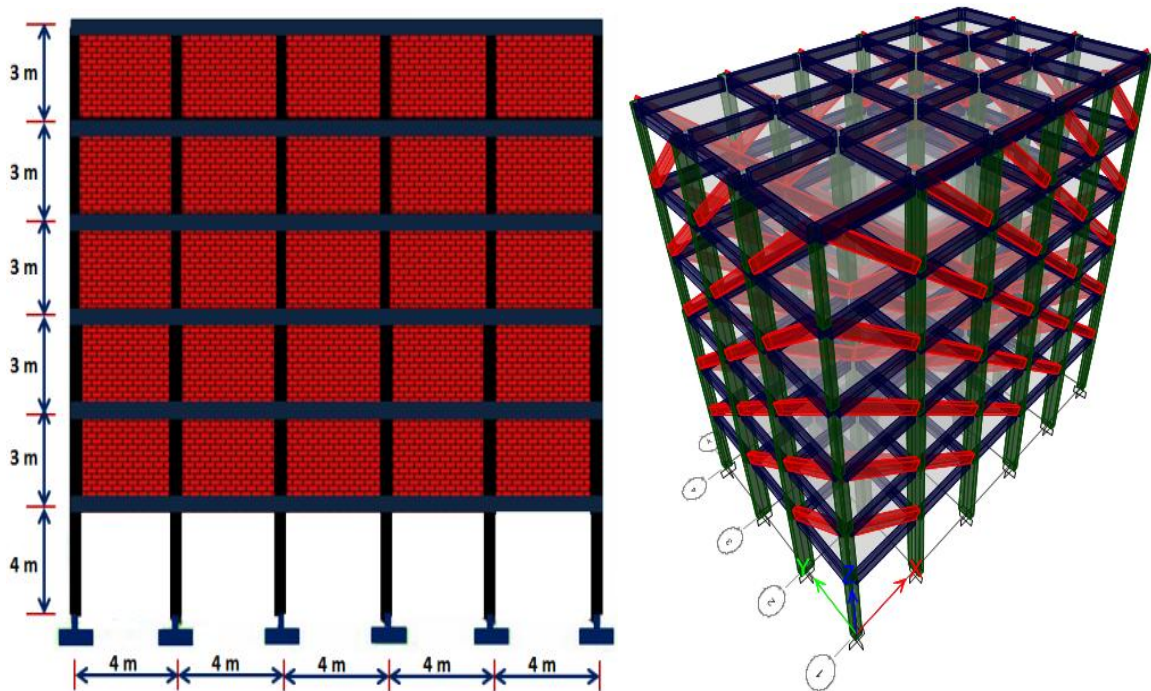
Schematic representation of typical front view and 3-D view of the masonry infill frame building model with open first story for the 6-story residential building
